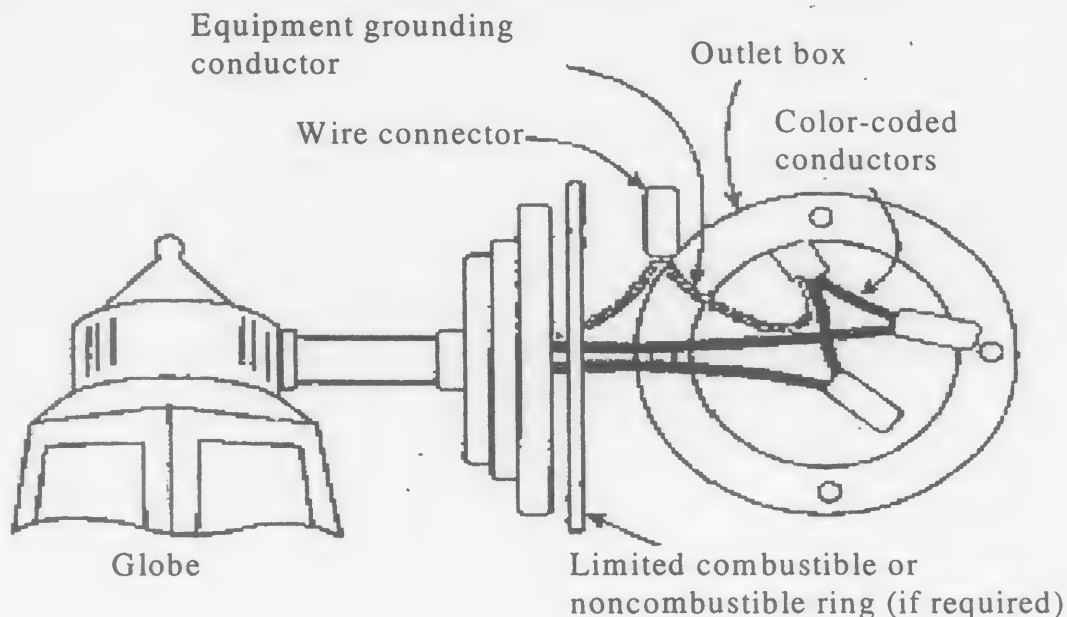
Typical Installation of Surface-Mounted Exterior Lighting Fixture.
